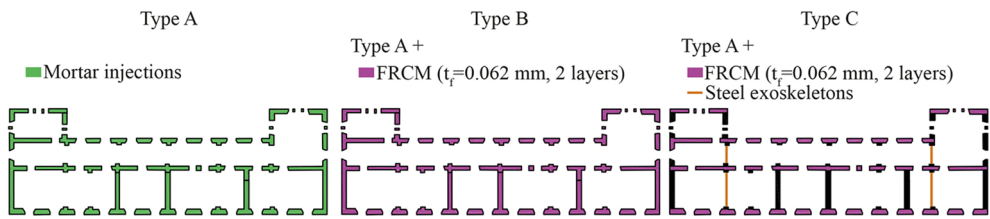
Interventions designed for BLDG 2 identified on the plan.
